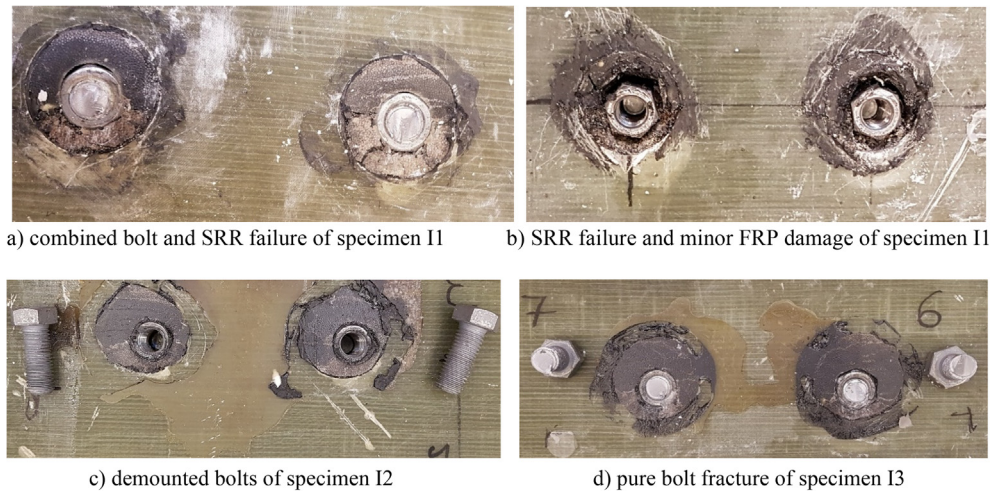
Bolt shear failure and damages in injection piece of injected SRR push-out specimens.
